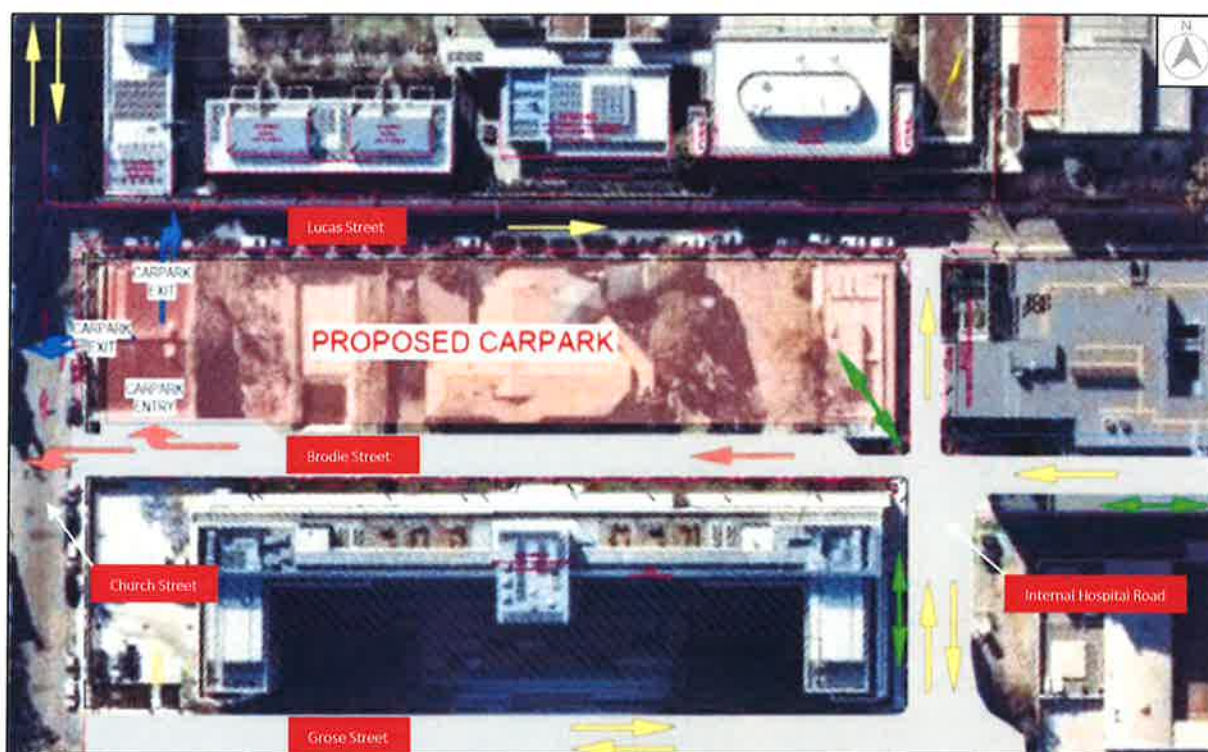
Proposed site access and egress arrangements (Source: EIS)
